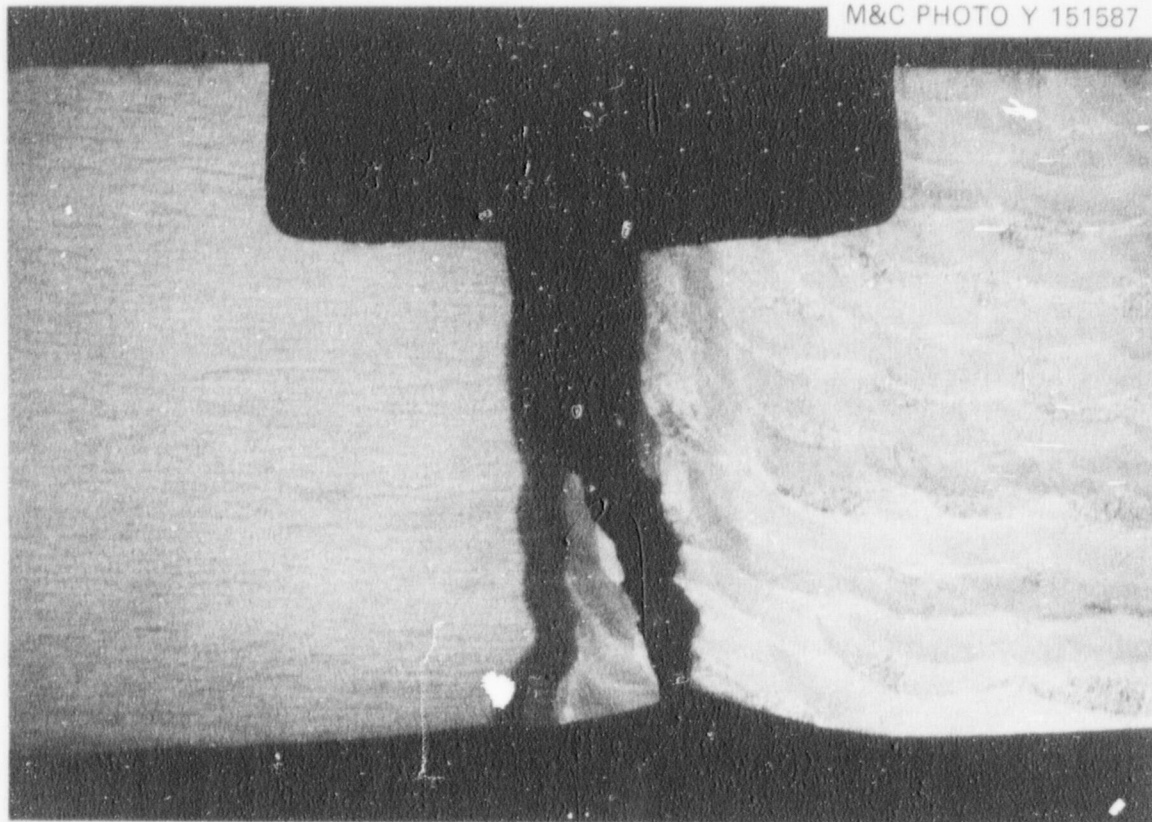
Face K_f (the face of slab K nearest the flange end of the vessel) of cross section of V-7B fracture.
